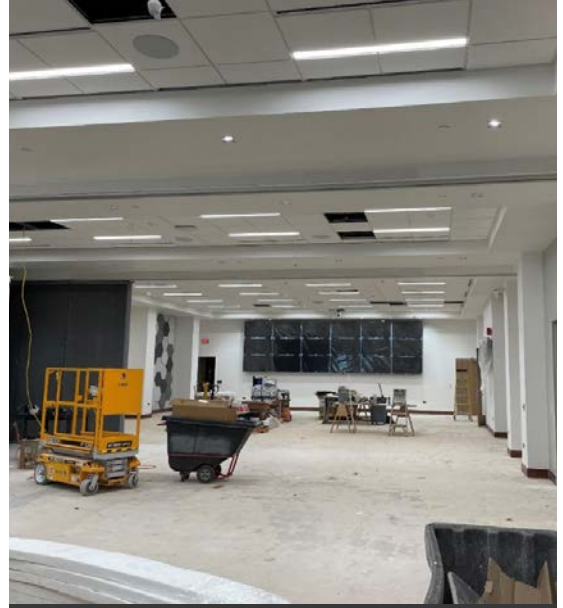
B-922 conference center renovation – room 106 cont.
